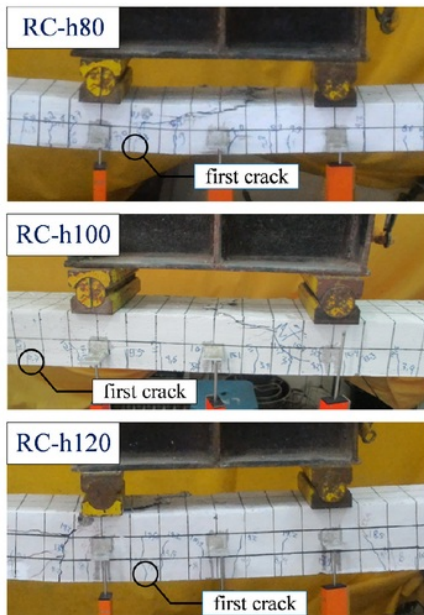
Crack pattern of the reinforce concrete specimens
